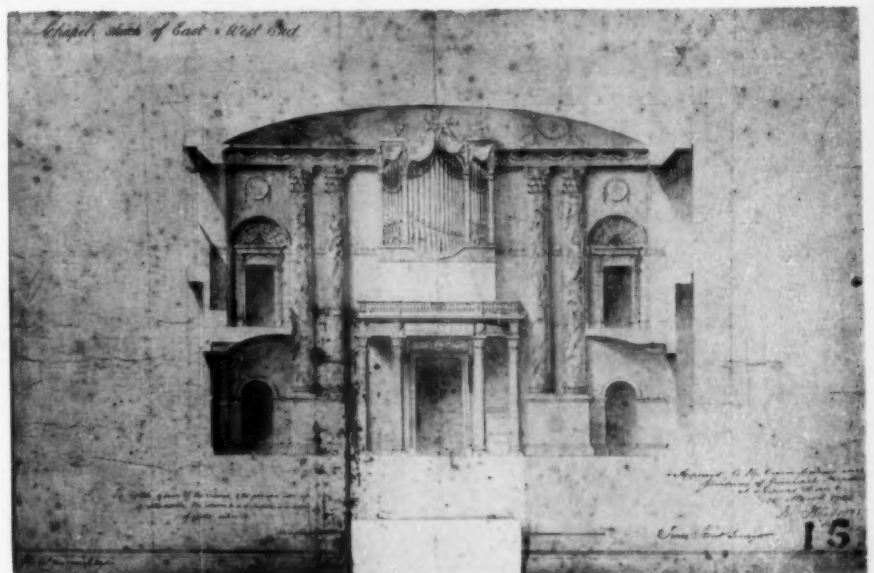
Design for West End of Chapel (The Same Drawing Shown in Fig. 3; But With Flap Raised)
